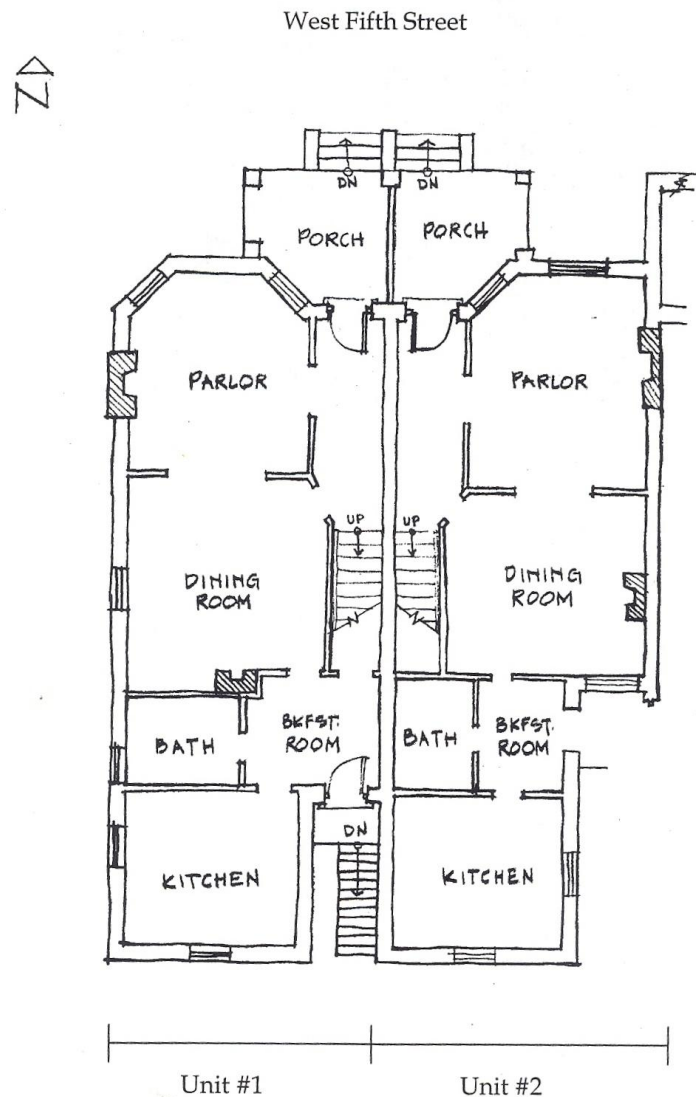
Sketch of floor plans for two units on West Fifth from 2004 Part 1 tax credit application by Hopkins and Associates
